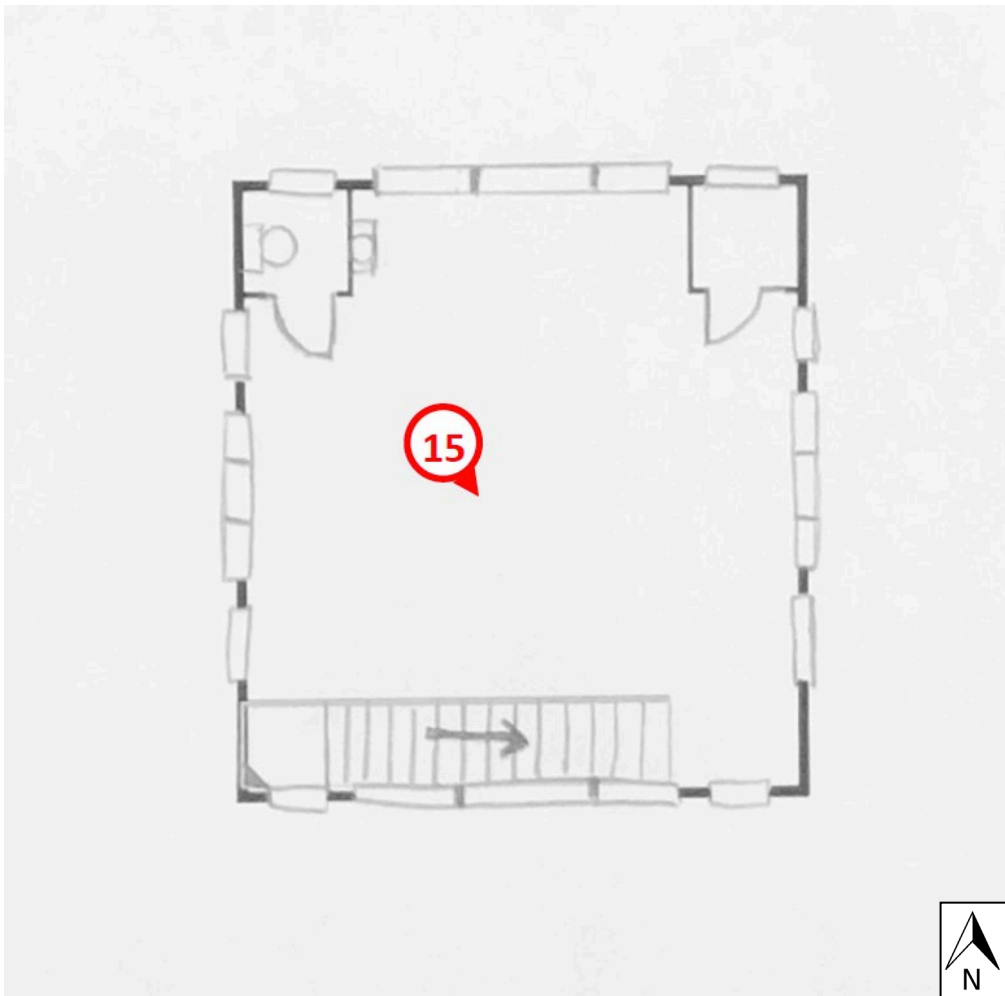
Floor plan and key to photographs, 2nd floor (plans not to scale)
